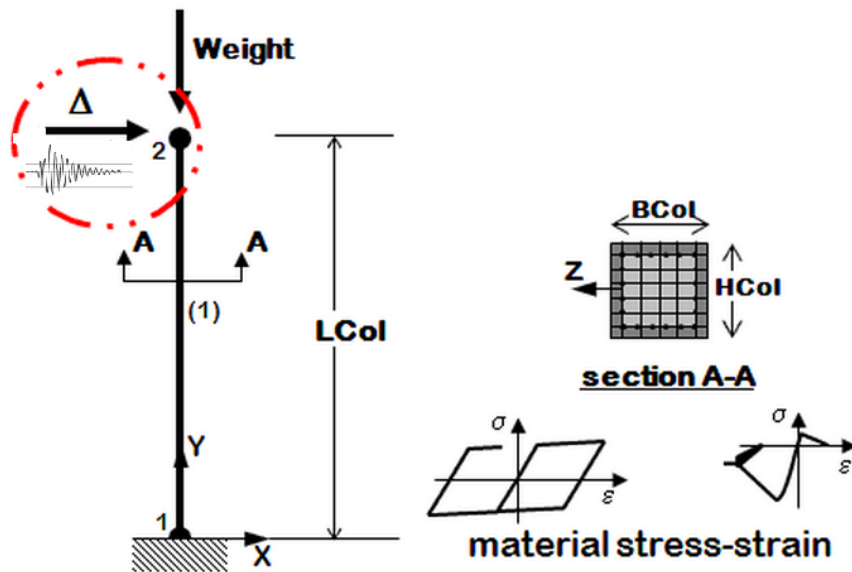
Fiber element technique used in reinforced concrete pier analysis under cyclic loading
